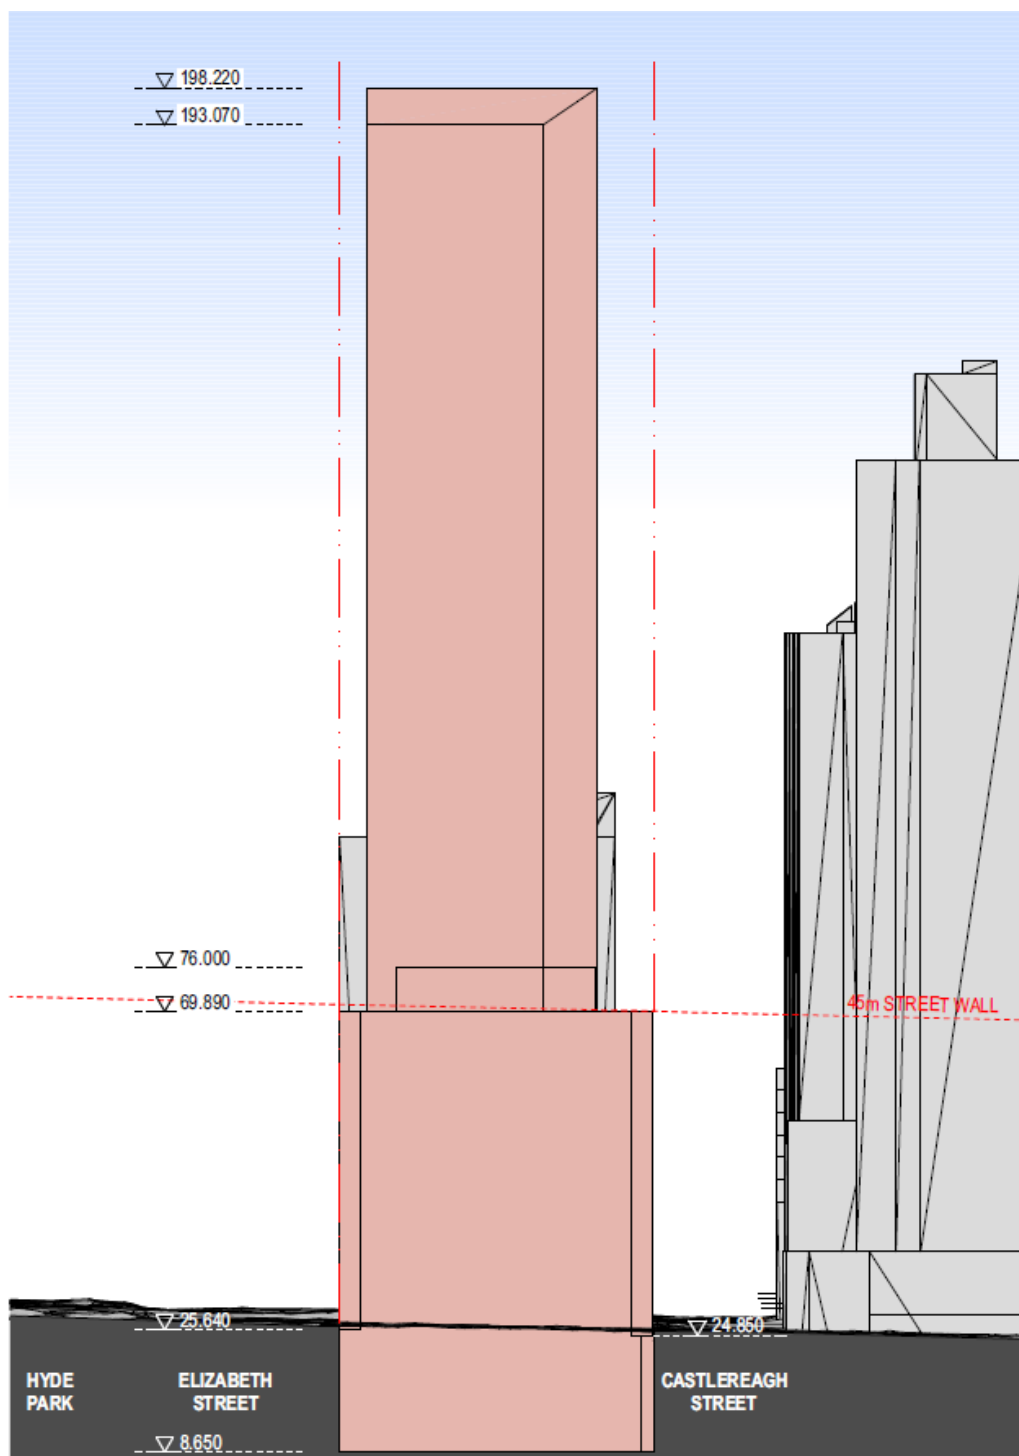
Approved maximum building height (shown on Park Street elevation of approved building envelope)
